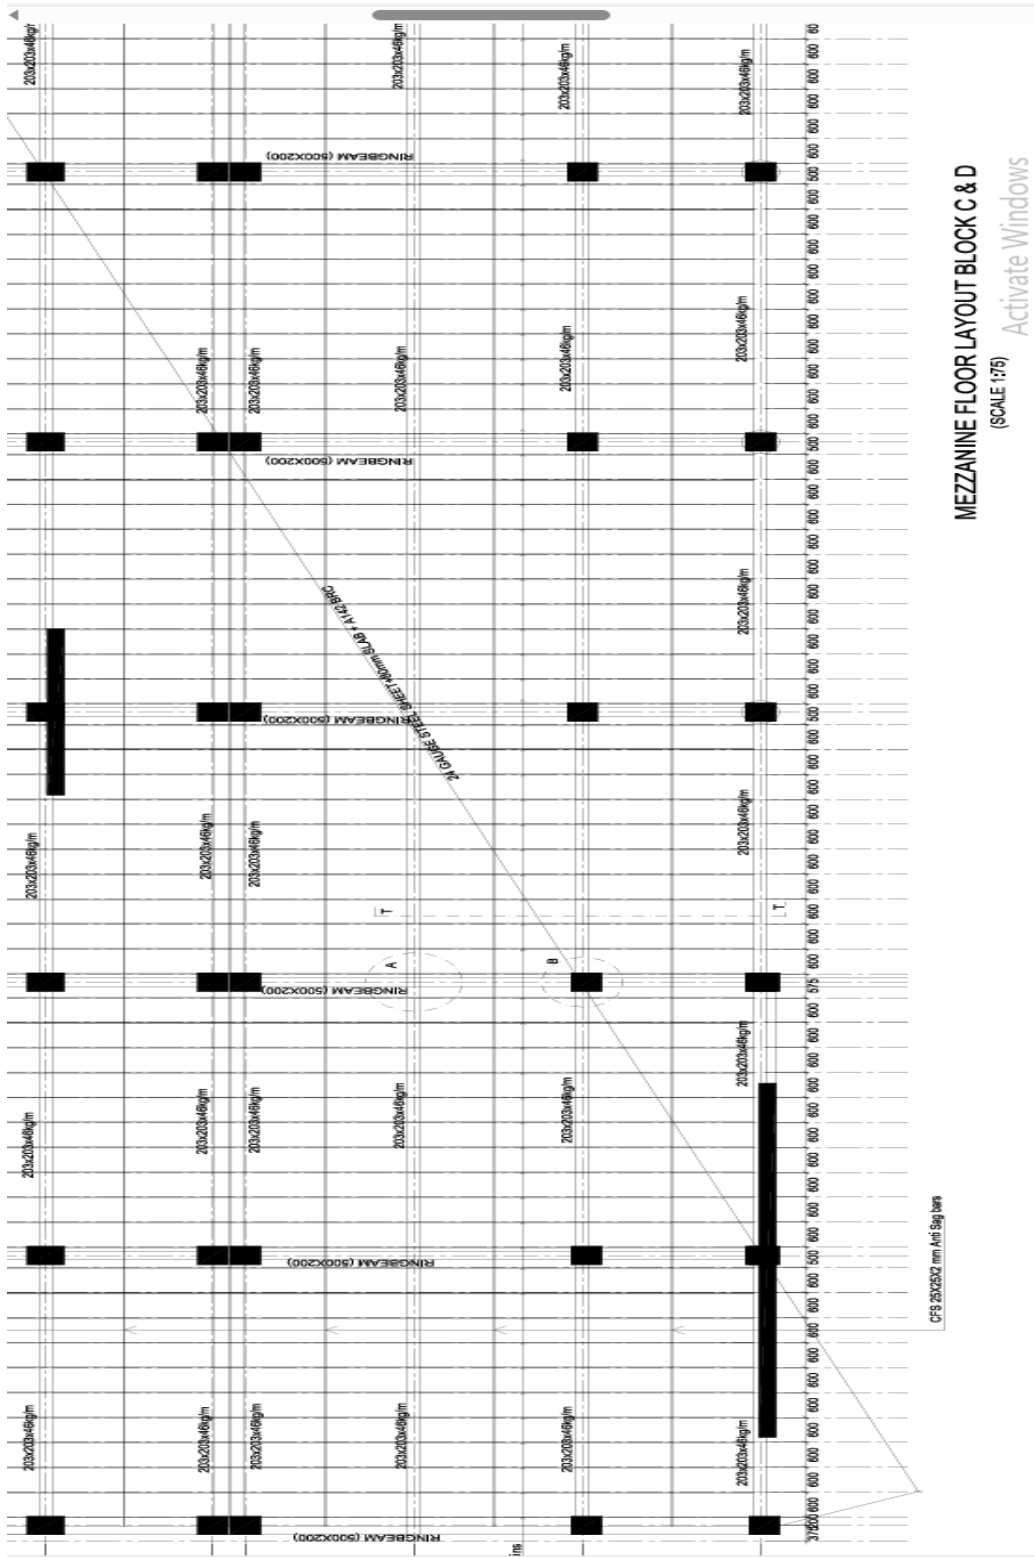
A structural drawing showing the layout and arrangement of structural members in an SSD slab
